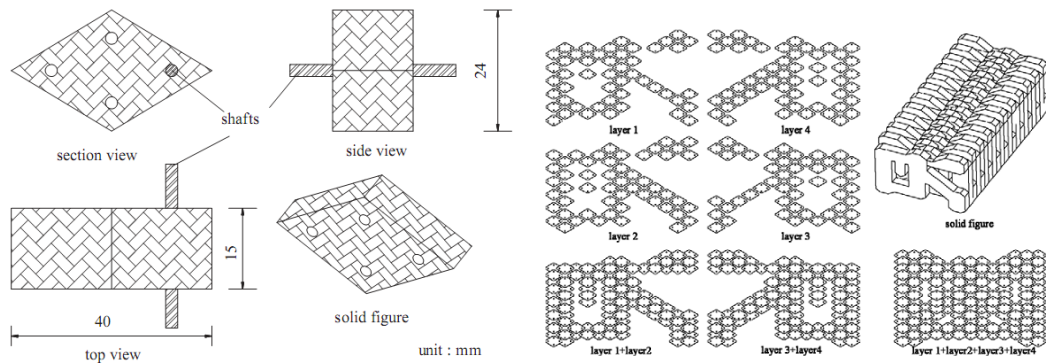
Sketch of diamond shape block (left) and arrangement of the blocks (right) (Wang and Sun, 2009)
